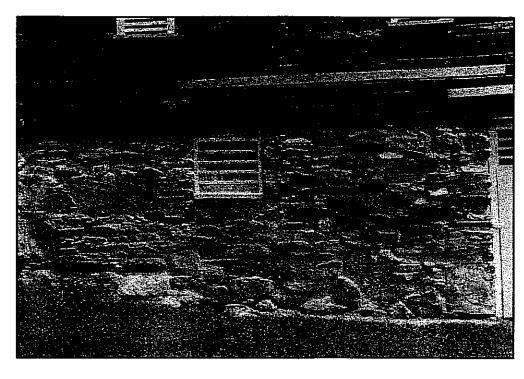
EAST ELEVATION STONE RUBBLE FOUNDATION WALL IS IN RELATIVELY GOOD CONDITION WALL SHOULD BE POWER WASHED TO REMOVE OLD LOOSE MORTAR AND OLD PAINT, AND "POINTED-UP" WITH MORTAR SIMILAR IN COLOR AND TEXTURE.
